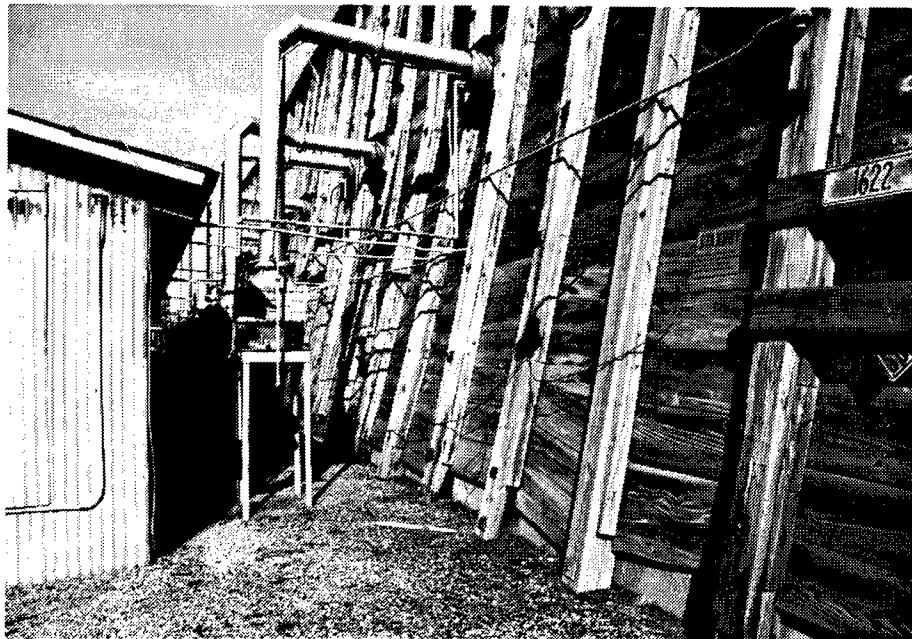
Building 1622: Filter blowers between a Blower House and barricade.
